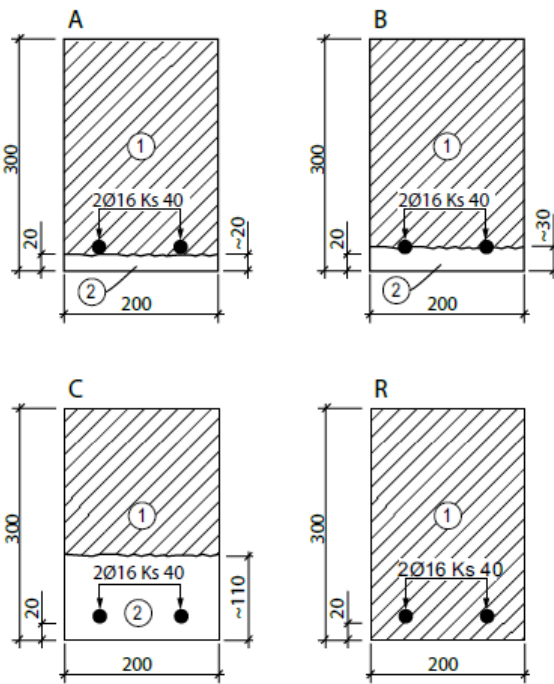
Cross sections of test beams with shotcrete overlay.¹⁰ The encircled numbers 1 and 2 indicate cast concrete and shotcrete overlay, respectively (Note: 1 mm = 0.04 in.)
